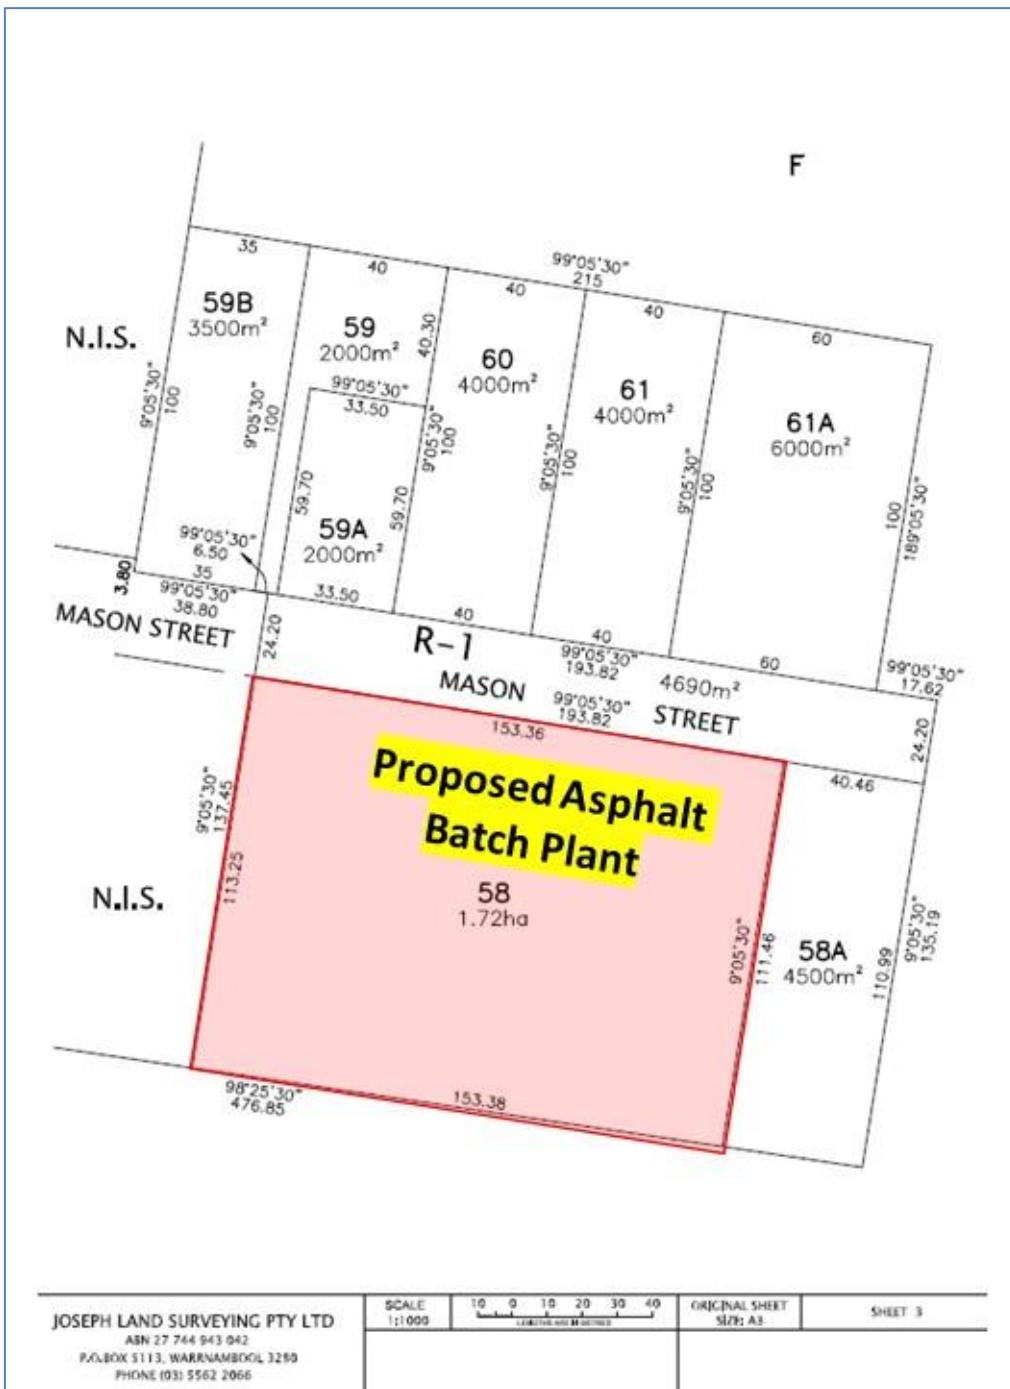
Proposed Asphalt Batch Plant on Lot 58
